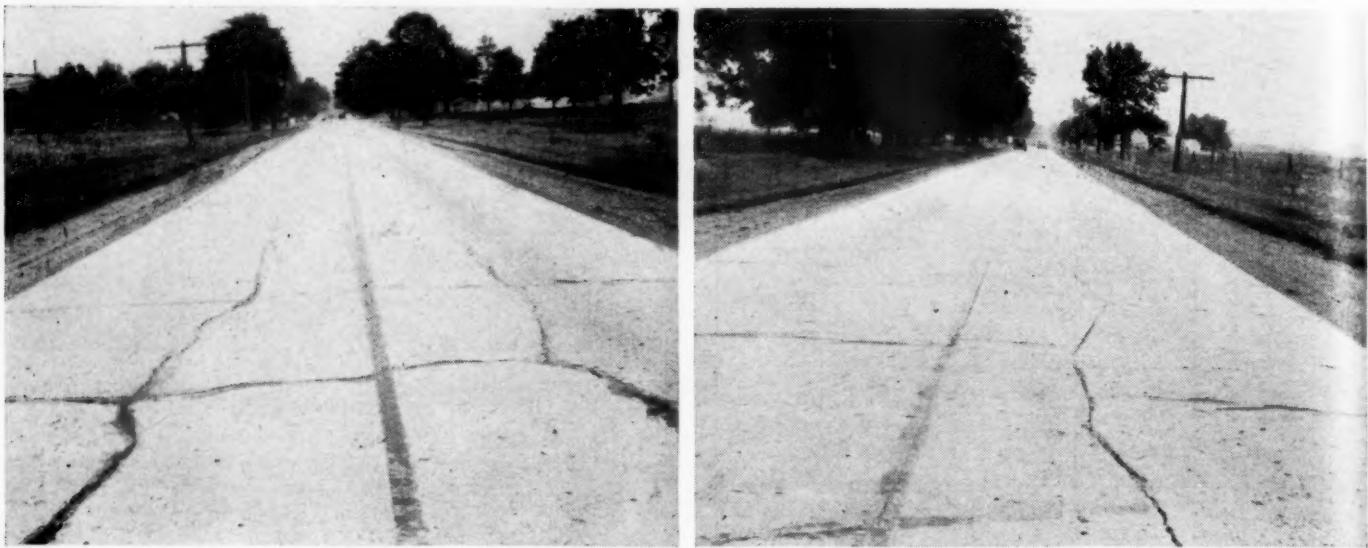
LONGITUDINAL CRACKING IN PAVEMENT WITH RIGID LONGITUDINAL JOINT.
